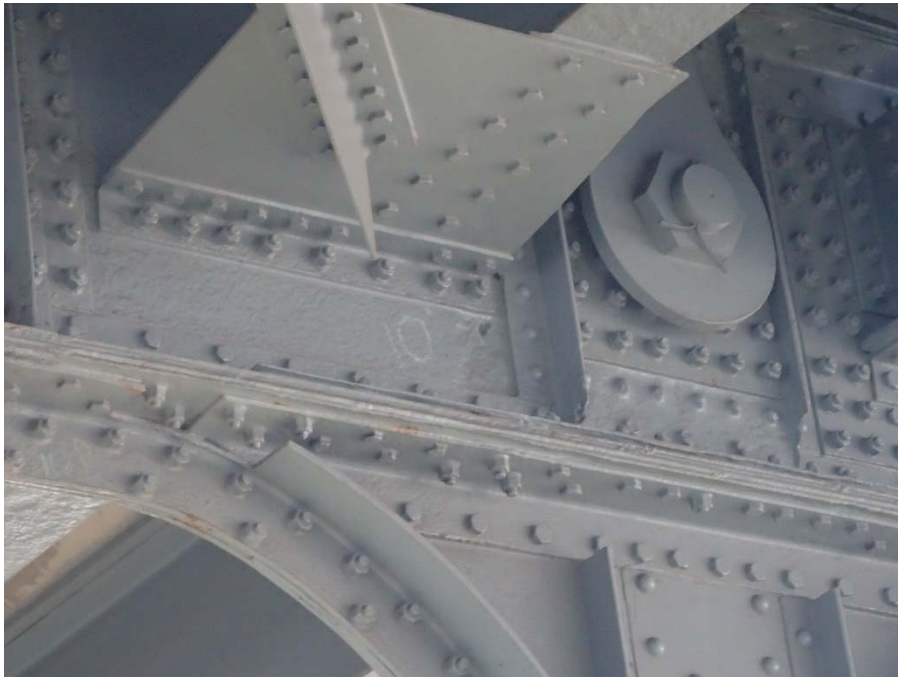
Span 4 Upper Deck Floorbeam 10'; web perforation below the upper deck lateral bracing gusset plate on the north arch
